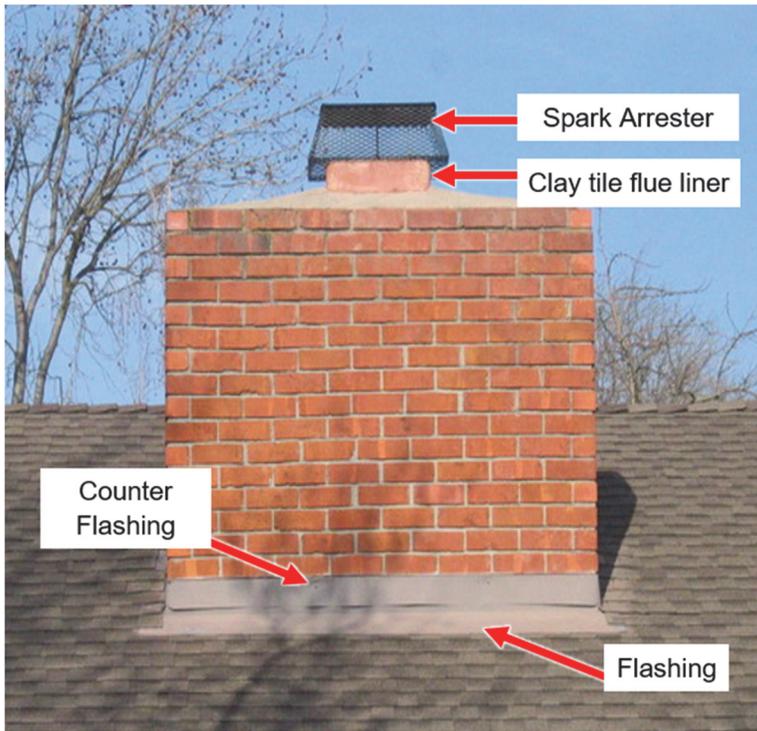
Undamaged masonry chimney above the roof (photo credit: Exponent).
